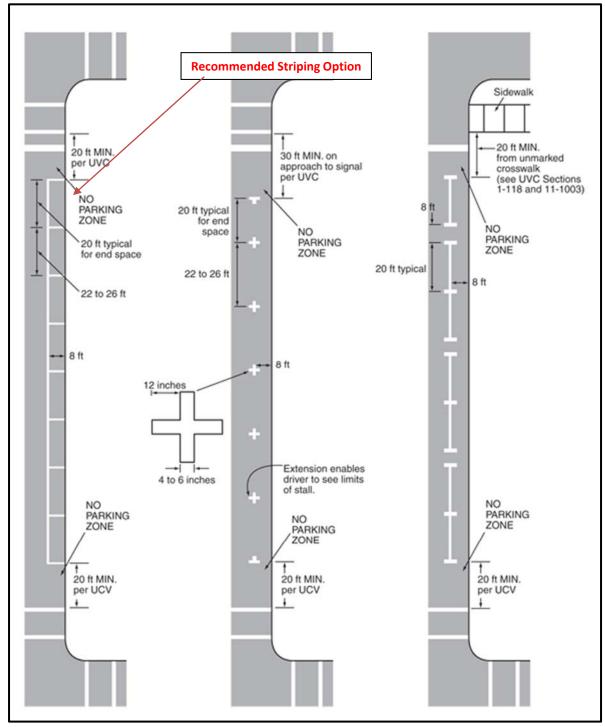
Examples of Parking Space Markings (MUTCD 2009)
